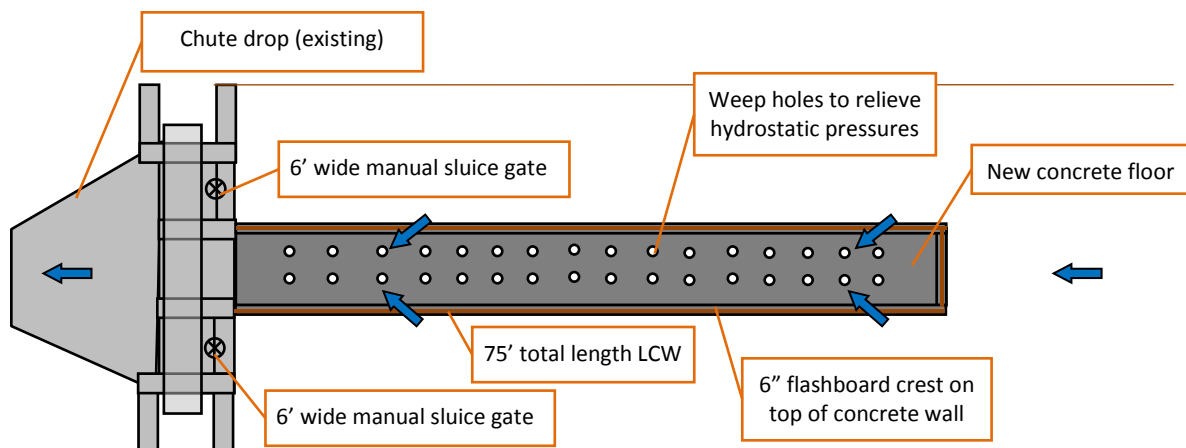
Conceptual plan view of new LCW structure in the Ninepipe Feeder Canal, at the outlet of the intermediate in-line pond (not to scale)
